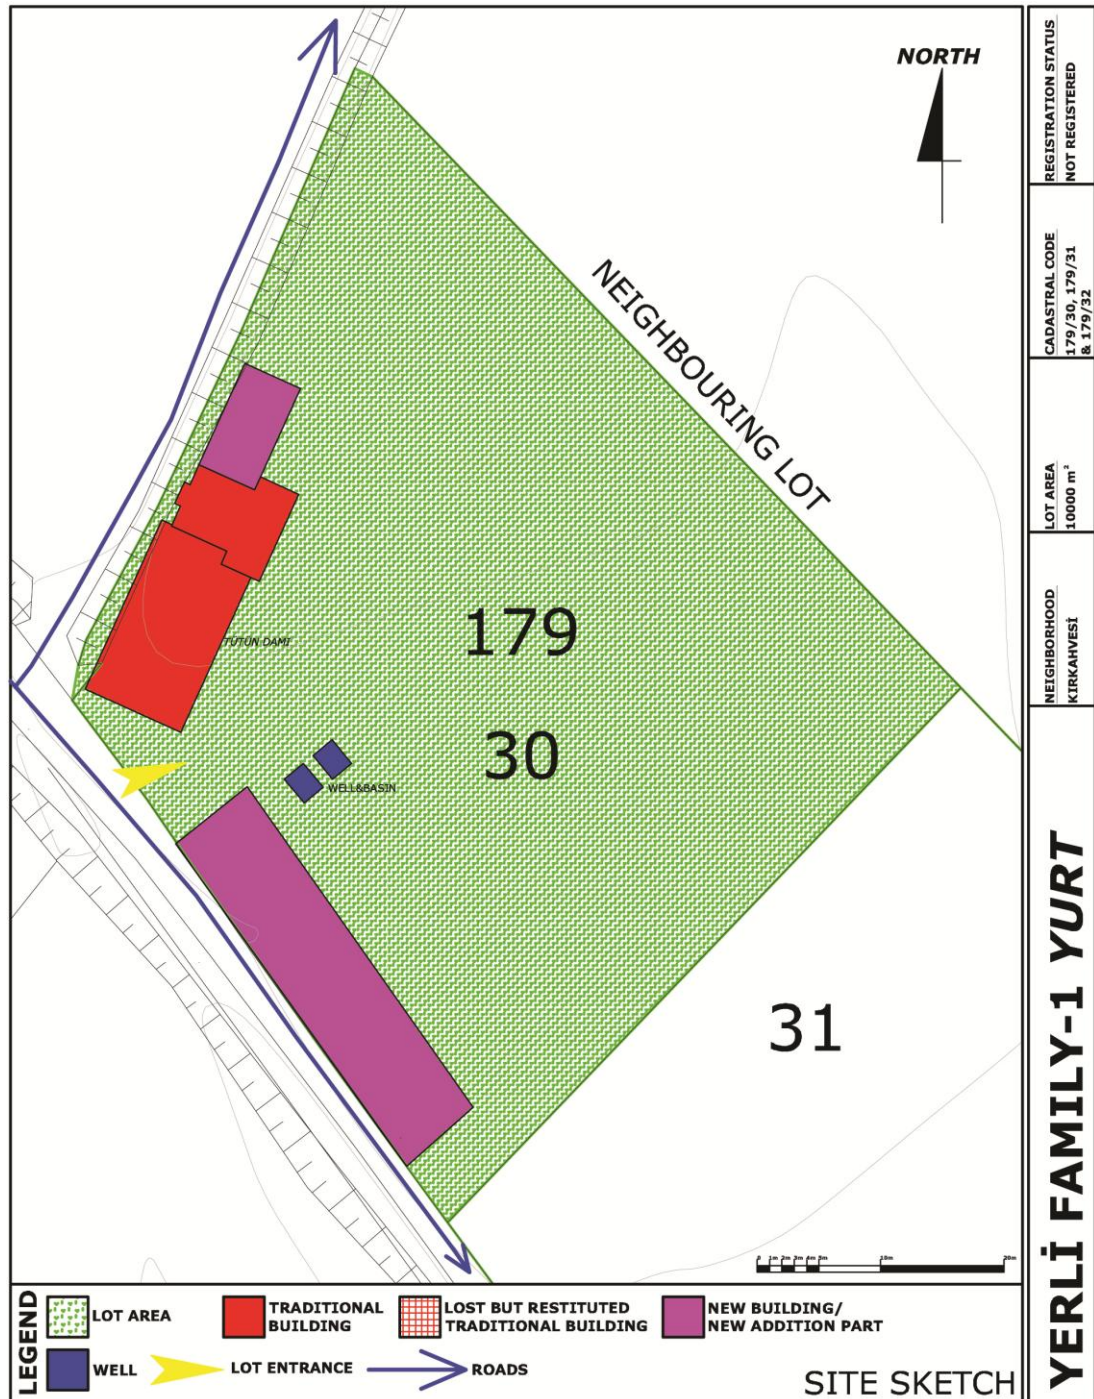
Site plan sketch of the *yurt* of Yerli Family-1
